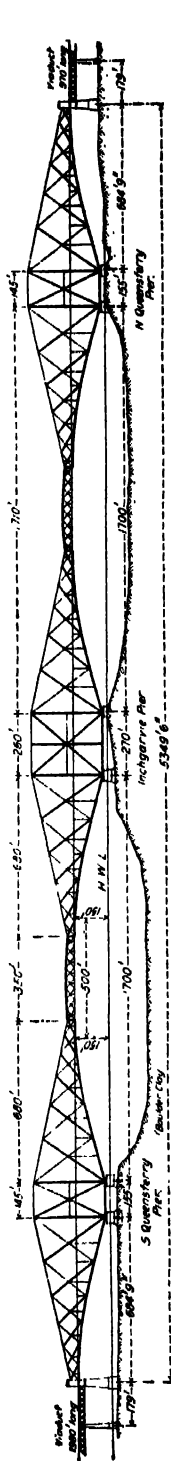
Bridge over the Firth of Forth at Queensferry, Scotland.
